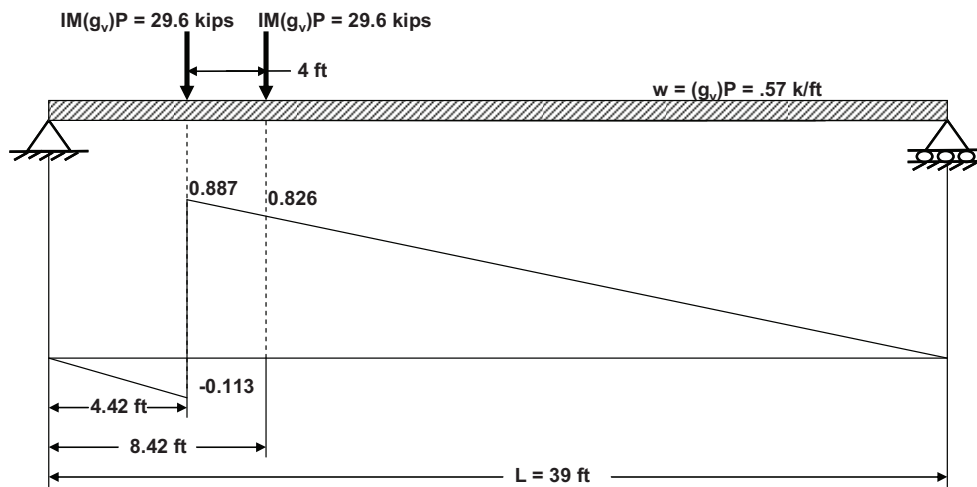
Interior Beam Shear Design Tandem at 4.42 ft from support
